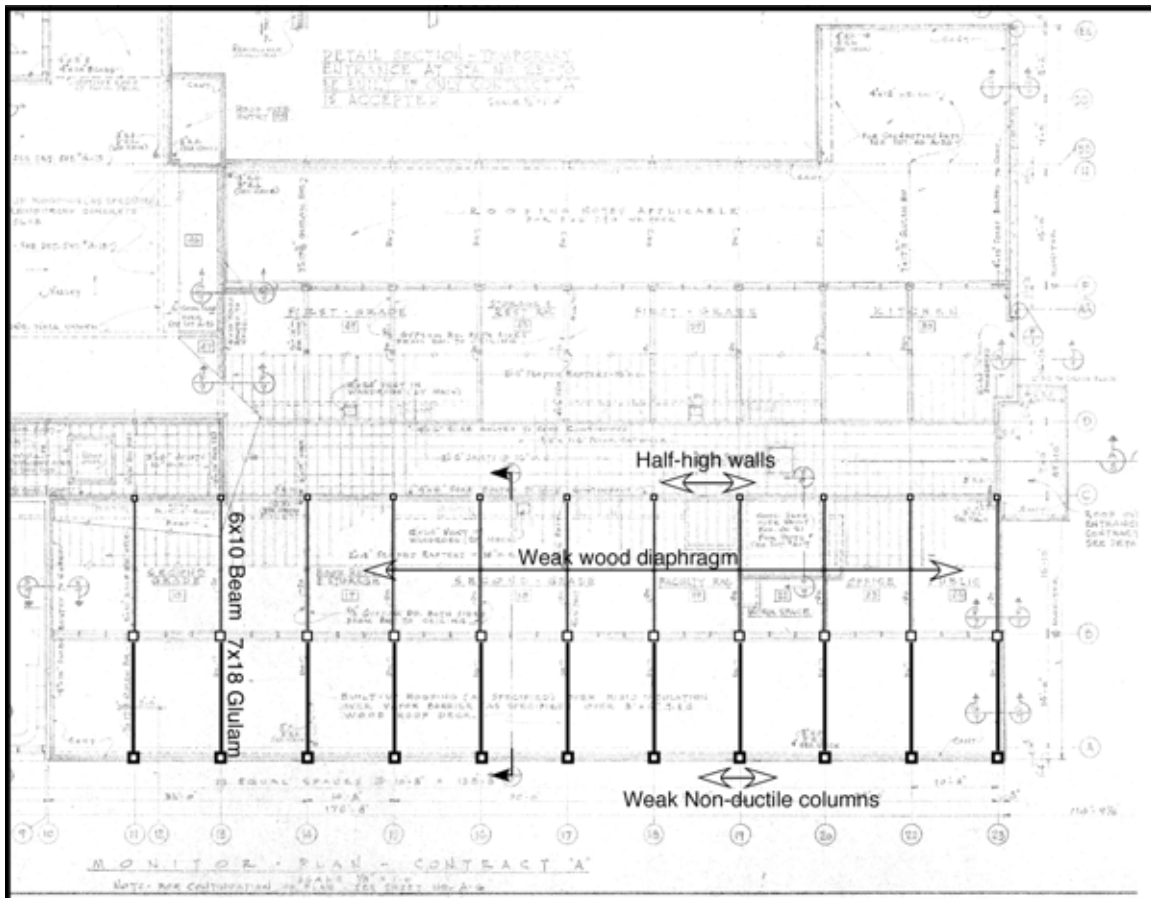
Middle School Plan, Highlighting Structural System (1952 Section)
